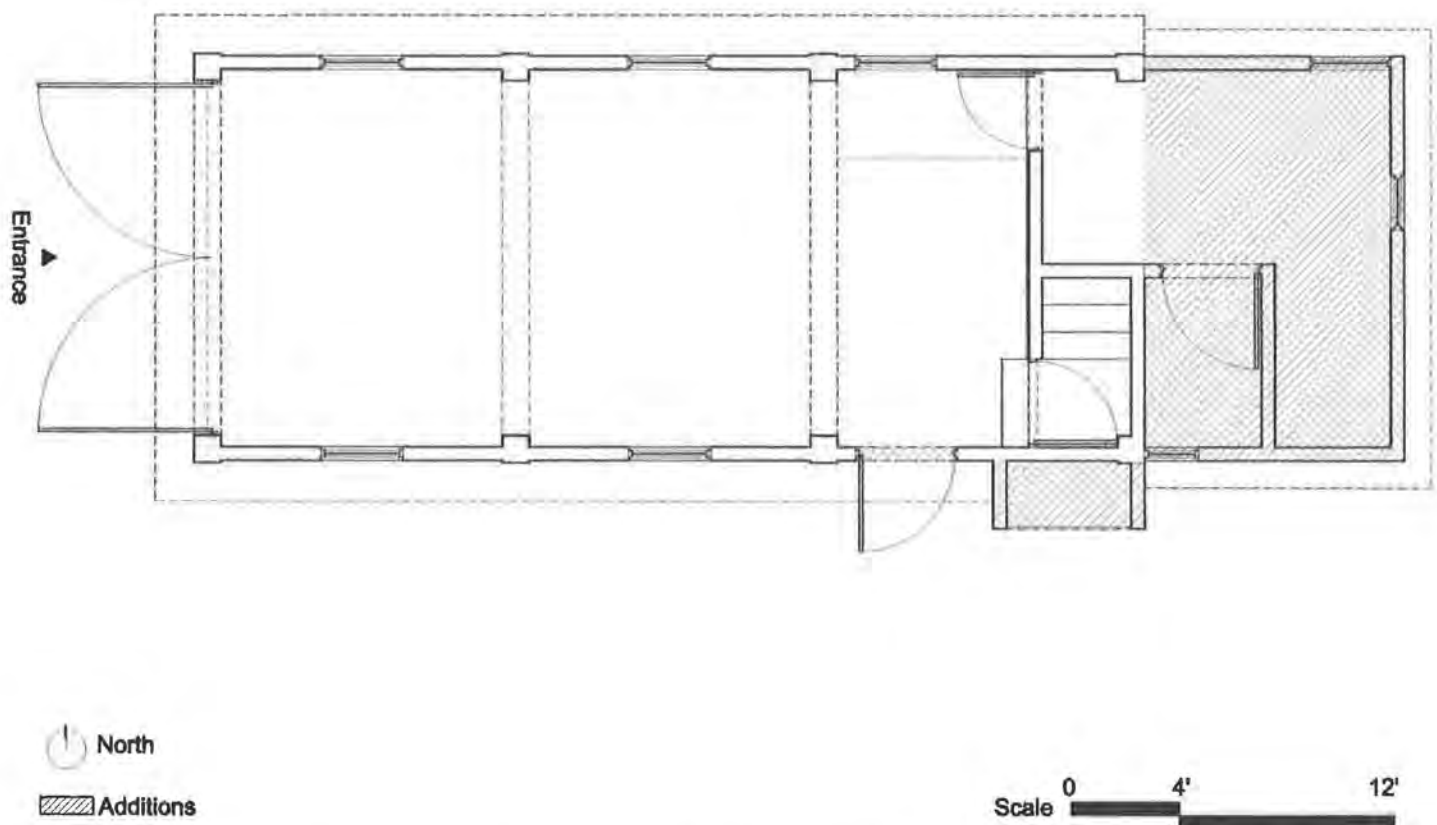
Ceiba Fire Station Ground-level floorplan. The Station was built from 1954, and follows one of the design prototypes officially endorsed by Puerto Rico's Fire Board after 1942, interested as it was in providing similar facilities at diverse Island locations. Prototype A was symmetrical in appearance, included two stories, and measured 14'-6" by 35'-0" in plan. The truck would occupy most of the first floor level, which could be reached by a one-flight stair from the second floor, where a communal bedroom with bathroom facilities (shower, toilet and sink) were housed. The sleeping area faced to the front and could be well ventilated by an ample door facing a balcony used to hang and clean the hoses. A round, tubular iron railing surrounded this open area, accommodating a flagpole. A window smaller than the others ventilated the bathroom. Openings on the second level were detailed with individual concrete eaves. A continuous one was provided around the first floor. Windows were originally in wood, sometimes louvered, others with glass panes. Drawing: Eduardo Miranda, Noviembre 5, 2012. Source: Jorge Rigau Arquitectos, San Juan Puerto Rico.
